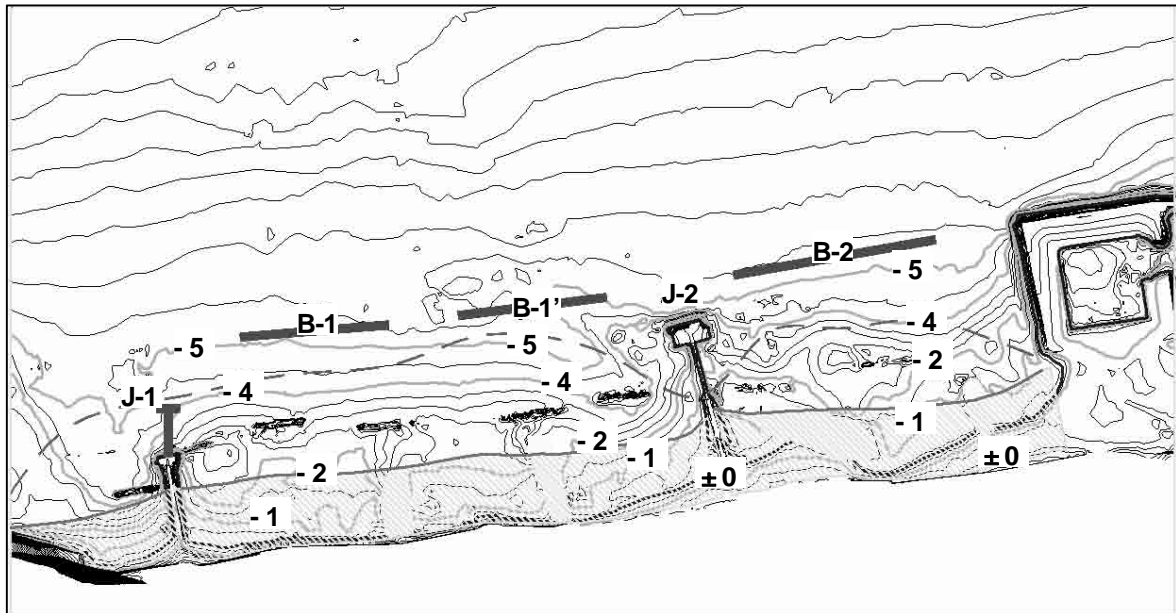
Layout of beach fill, jetty extension and submerged breakwaters
